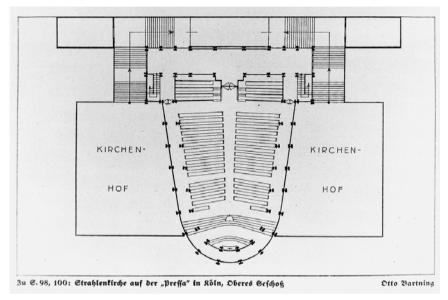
Plan, Stahlkirche (Source: Müller-Wulkow, 1929, p. 110)
